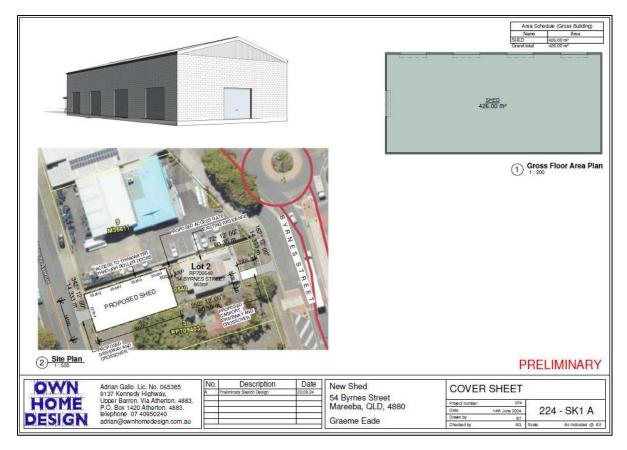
Proposed Warehouse development plans. (Own Home Design)
